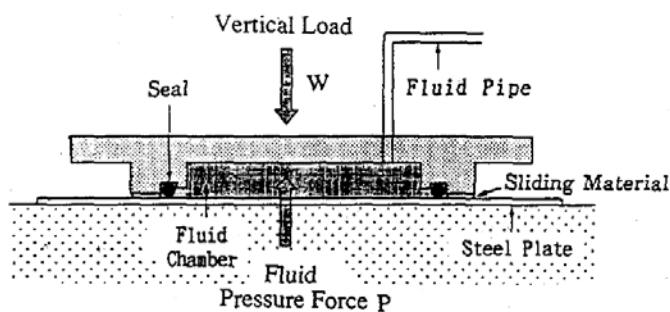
Idealised view of friction controllable sliding bearing (from Feng)
